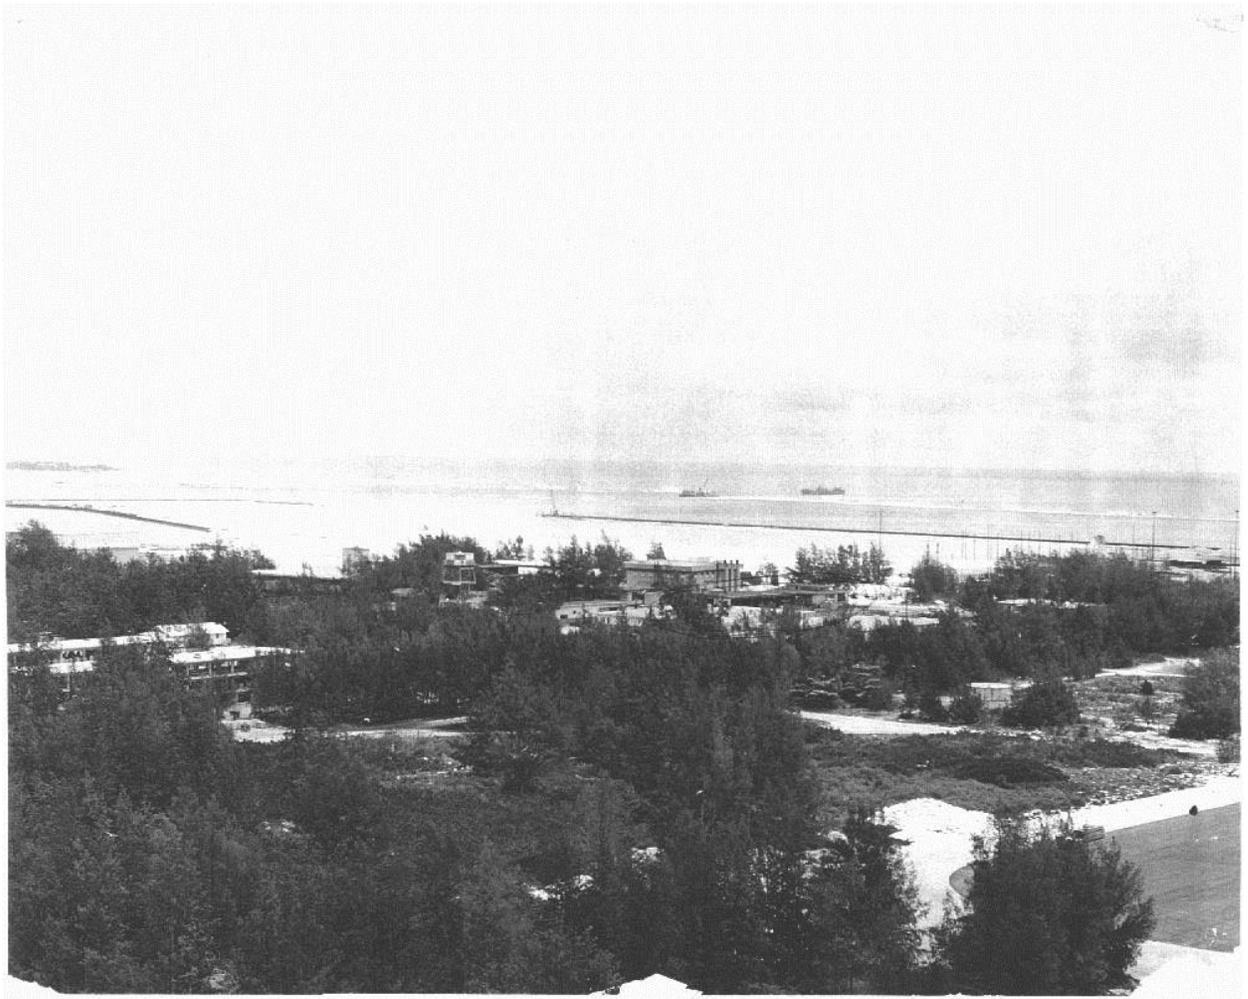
1957 Overview, showing installing sheet piling being constructed.
